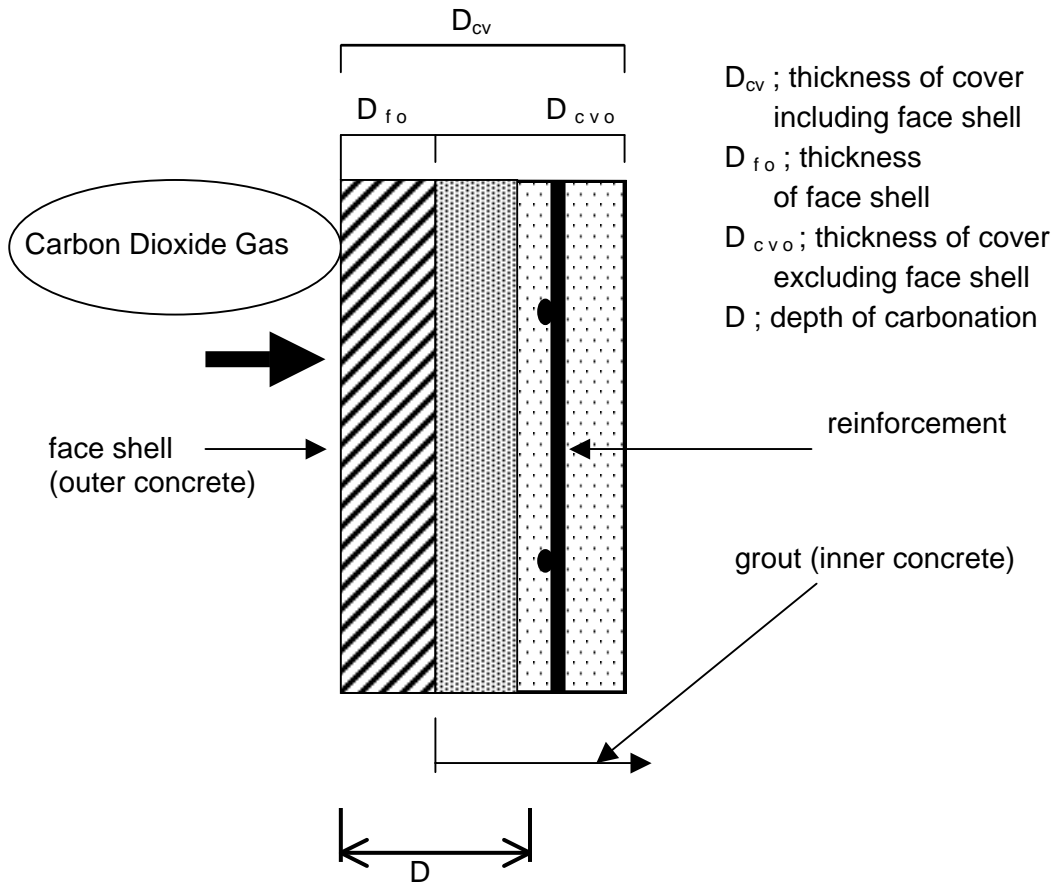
Schematic Diagram of Components of Fully Grouted Reinforced Masonry Walls
